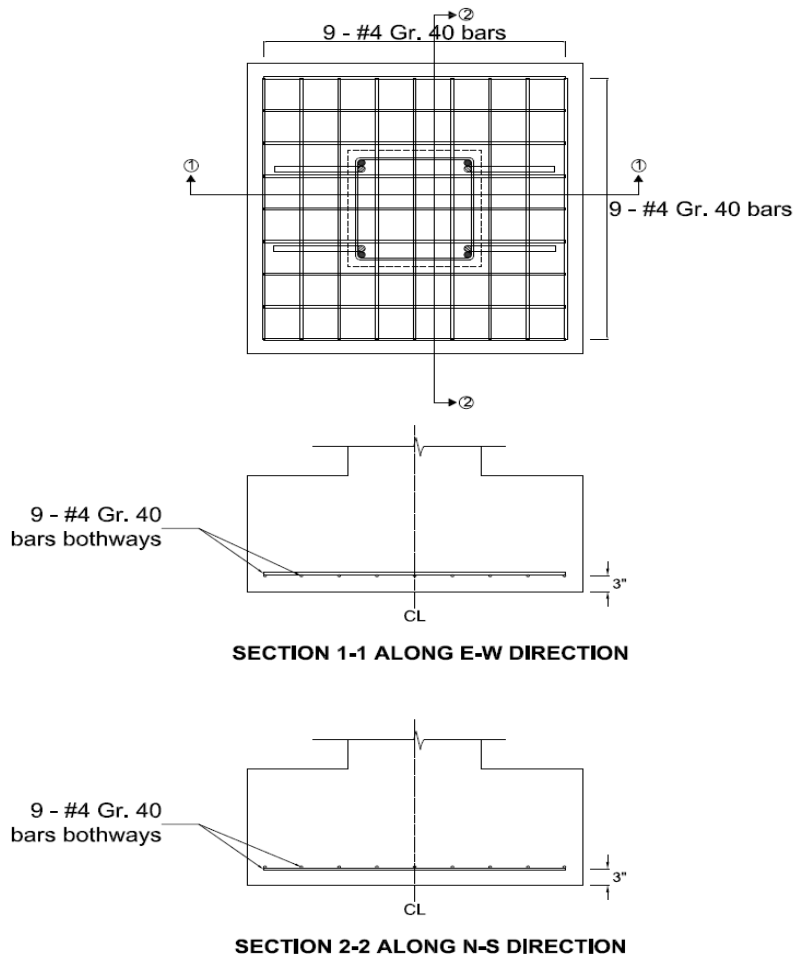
Typical footing reinforcing details for direct attachment to strong floor
